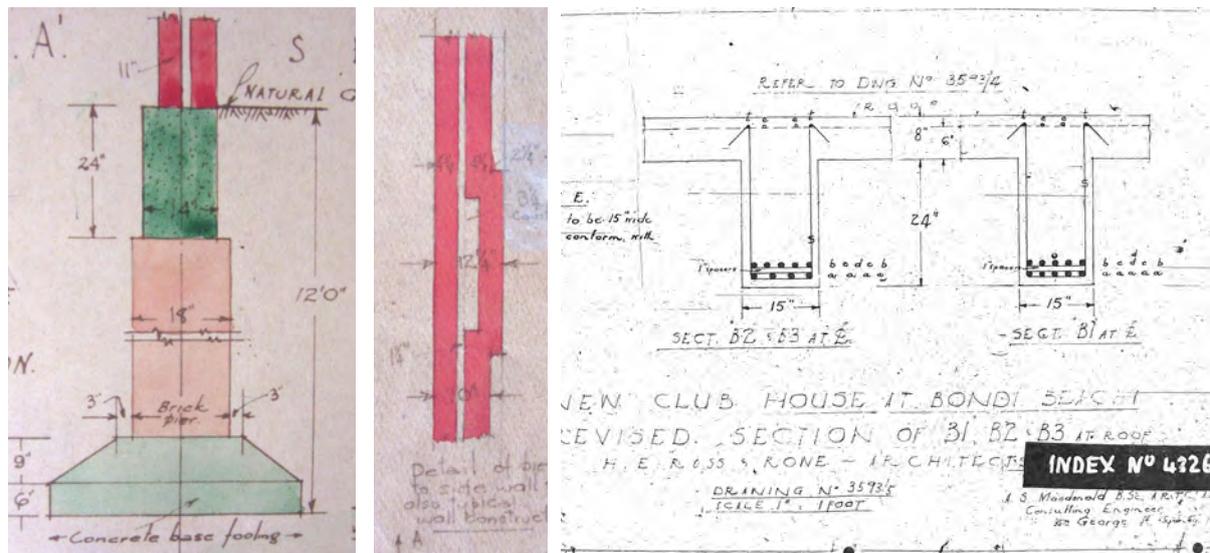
The original drawings show the 12' deep footing structure in section at left and the brick cavity wall structure in plan at right. Drawing conventions and note indicate the concrete pale green/green and brickwork pink/red. Source: WLS drawings Waverley Council Index No 432619 (left and centre) and No 432603 (right)
